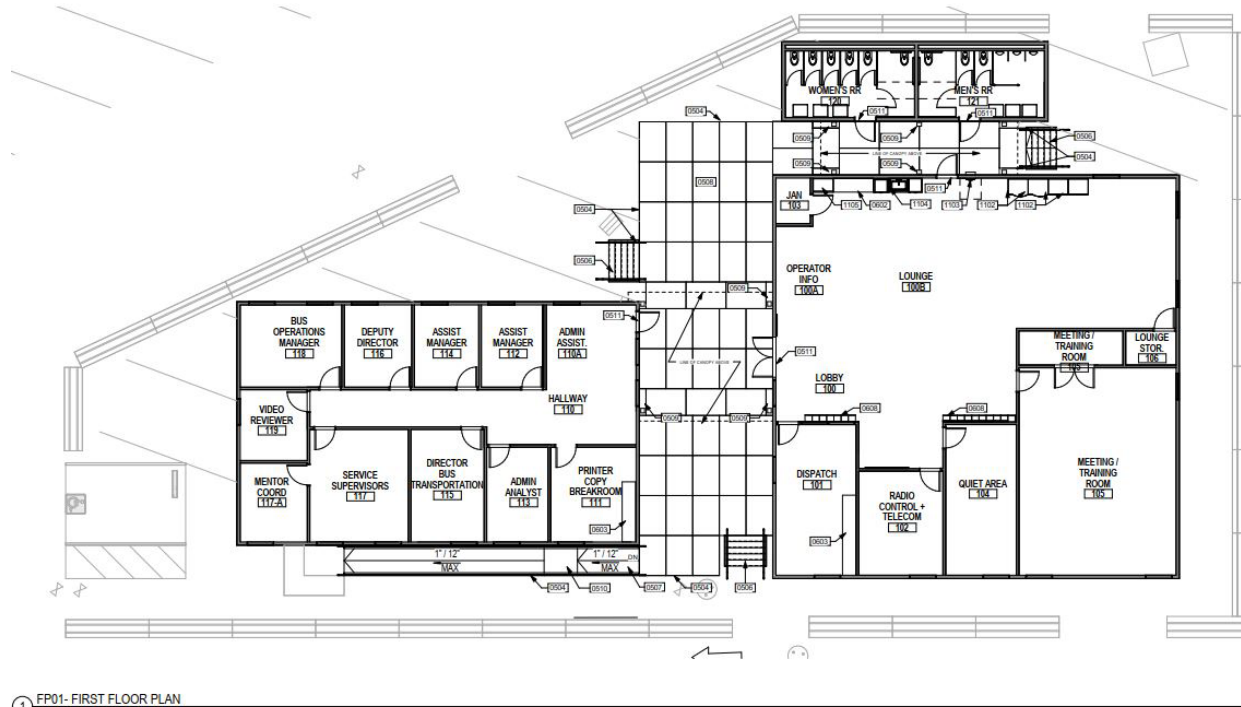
Illustrative Temporary Building 200 First Floor Plan
